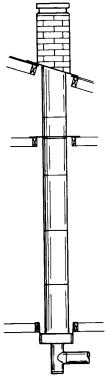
Prefabricated metal chimney used with oil-, gas-, coal-, and woodburning fireplaces. (Courtesy Metalbestos)
